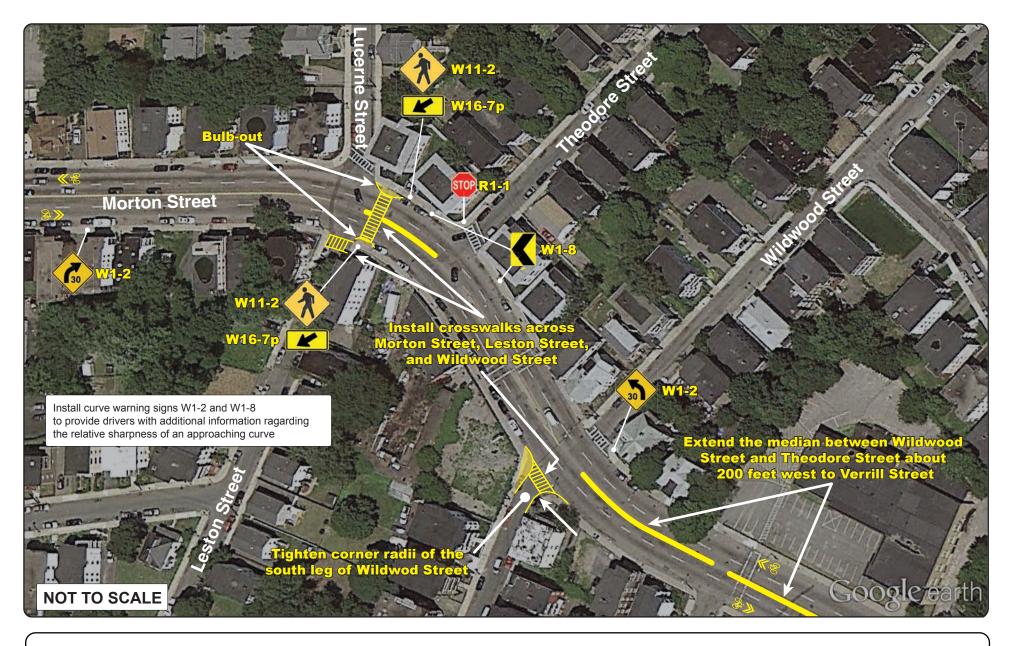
Proposed Improvements at Morton Street: Between Wildwood Street and Lucerne Street
